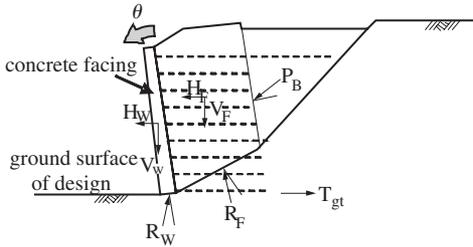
Modeling of GRS retaining wall for evaluation of overturning.
